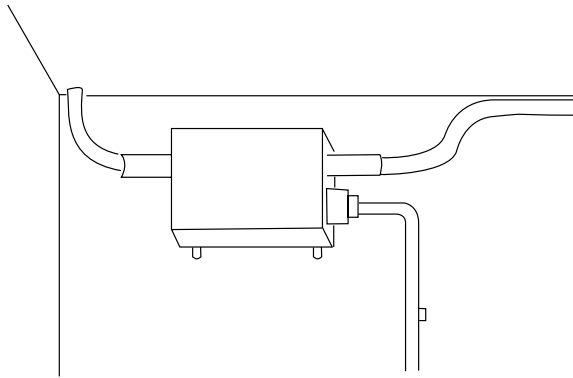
(20) Example of Mounting Transceiver and AUI Cable on Wall Surface (4)
